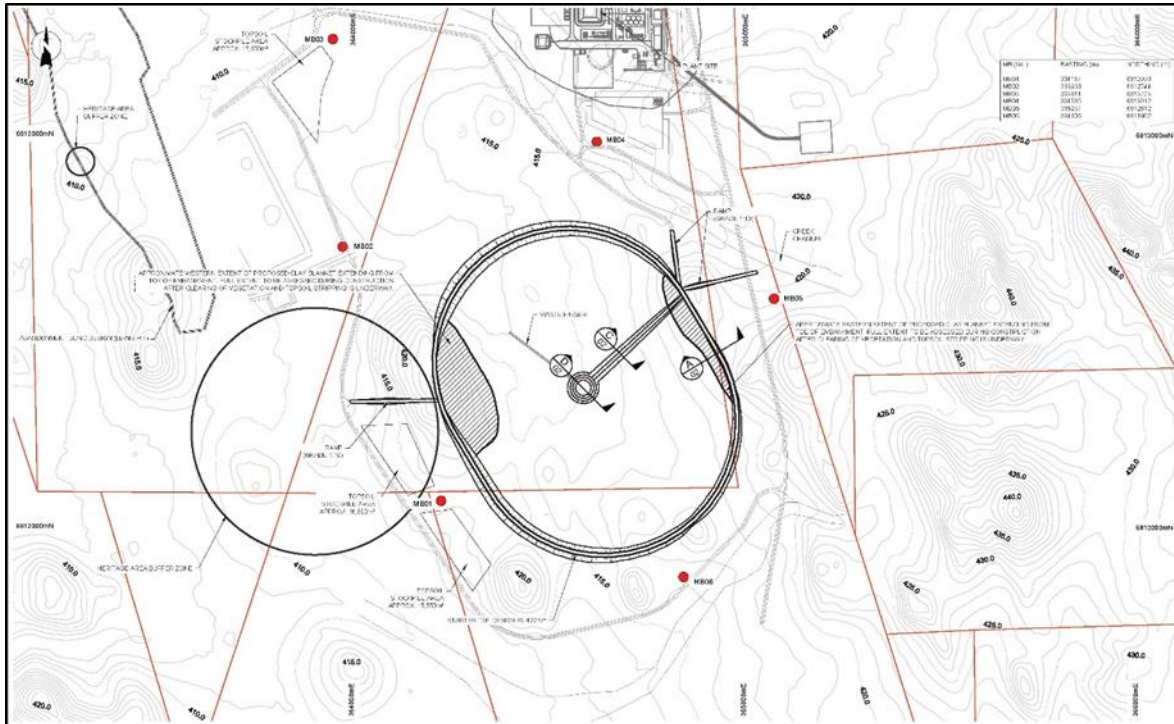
CGP infrastructure highlighting the Tailings Storage Facility.
